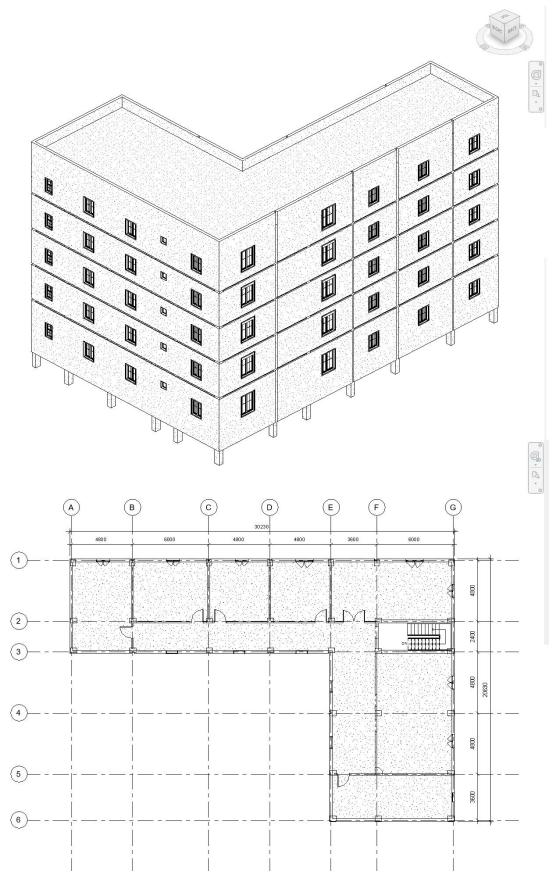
The test model 3D (Above), typical floor plan (Below)
